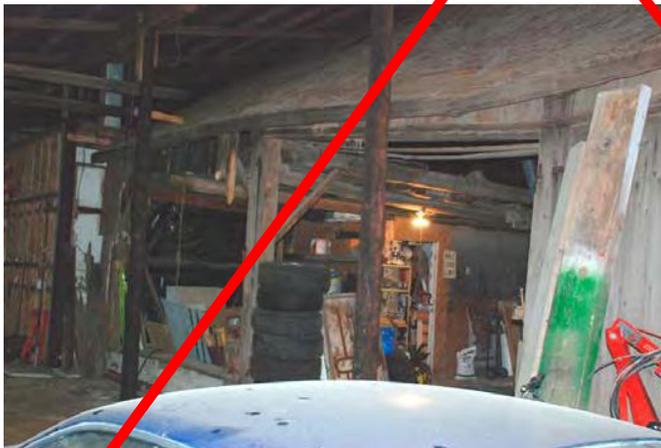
remnant portion of 19<sup>th</sup> century barn, southeast corner
